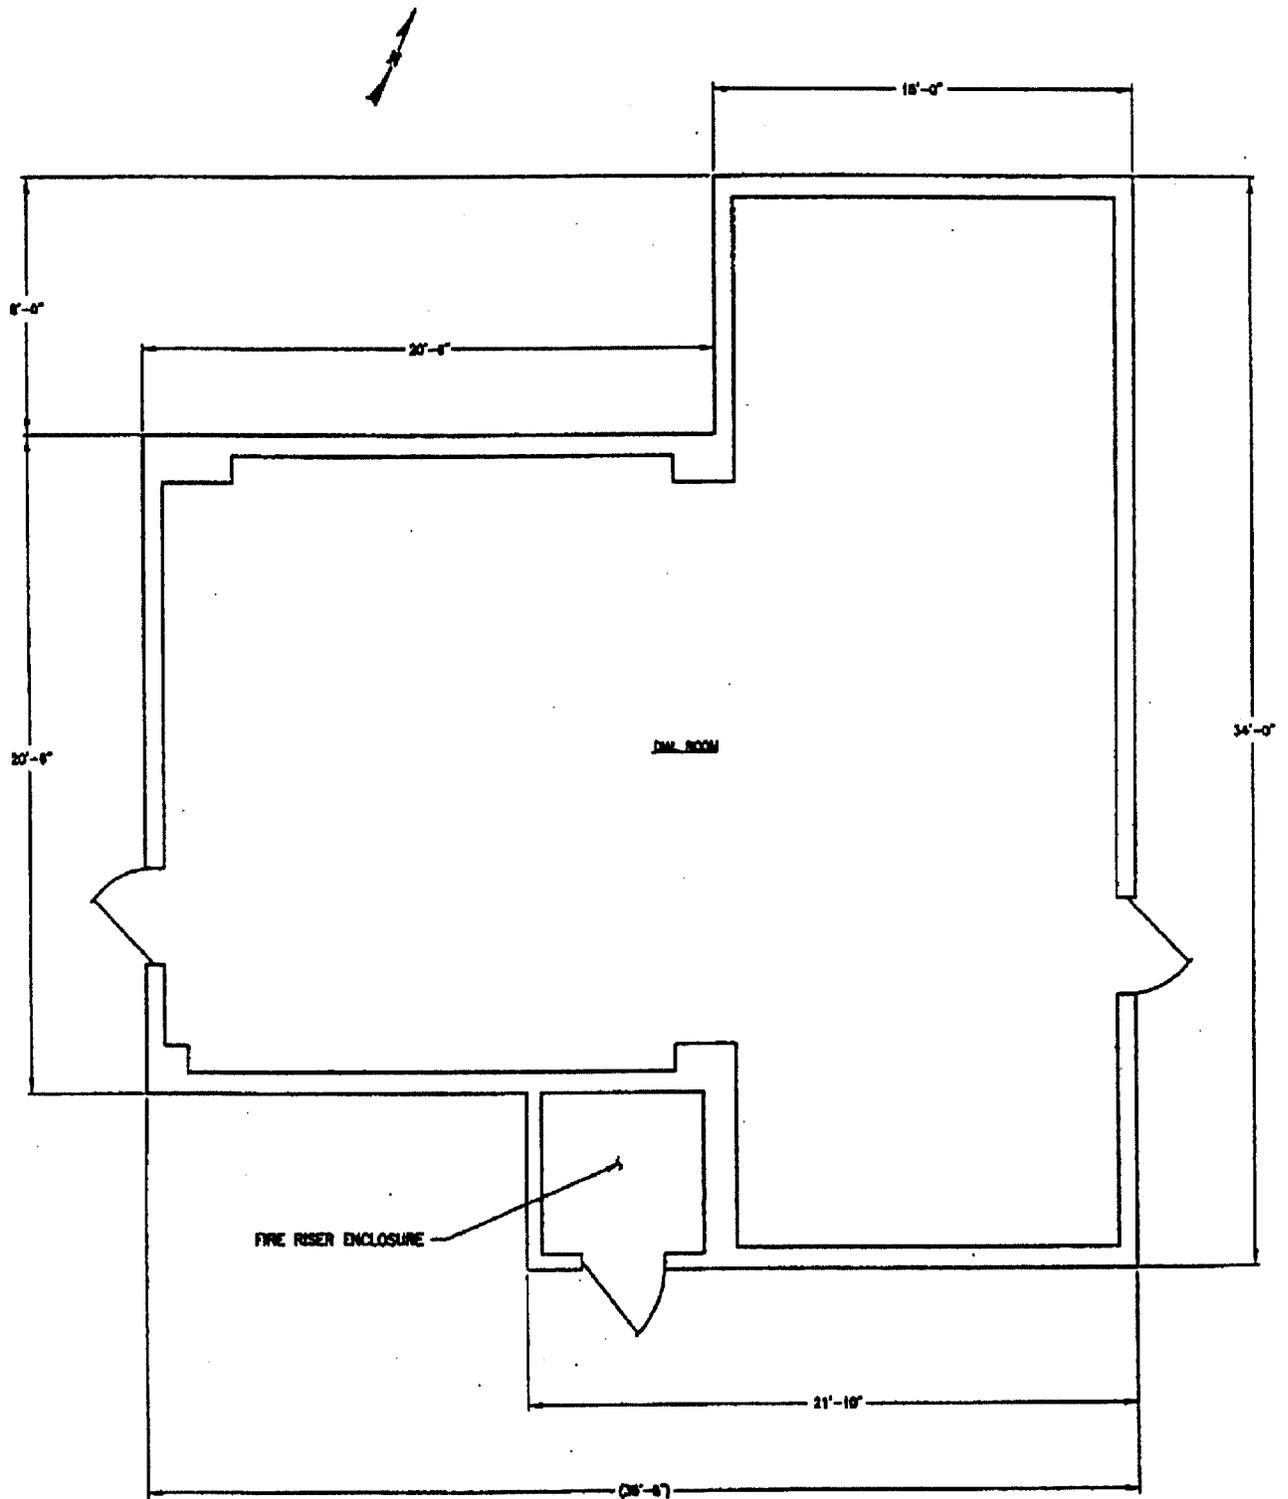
Typical floor plan of the communications building (WMF-619).
